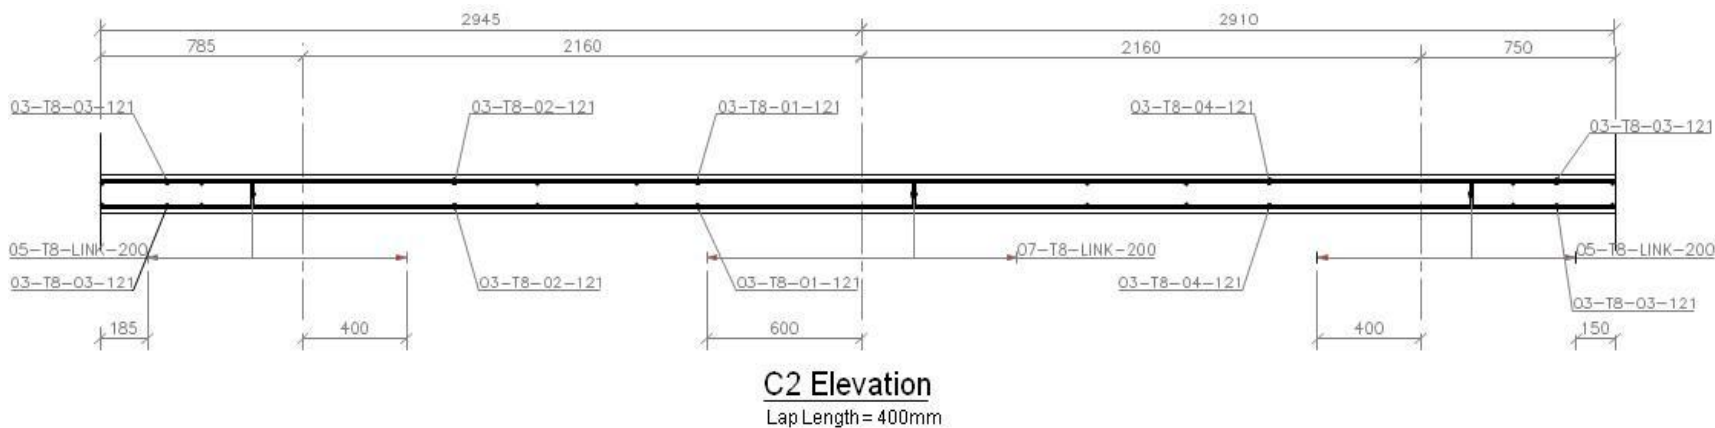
Elevation of reinforcement detailing of sample C2.
